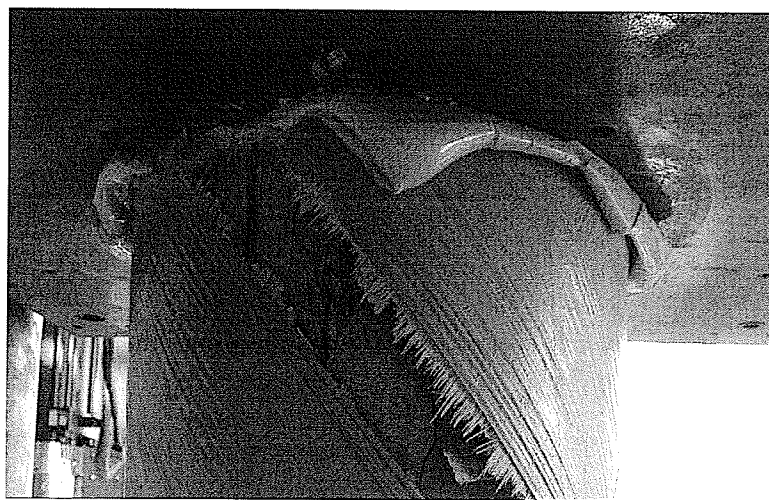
Failure of the FRP shell near the bottom of the E-glass/epoxy shell pure axial load specimen.
